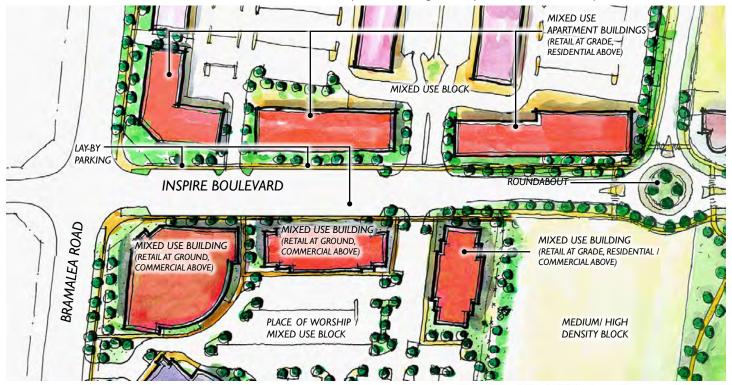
Primary Gateway Example at Bramalea Road and Inspire Boulevard.
